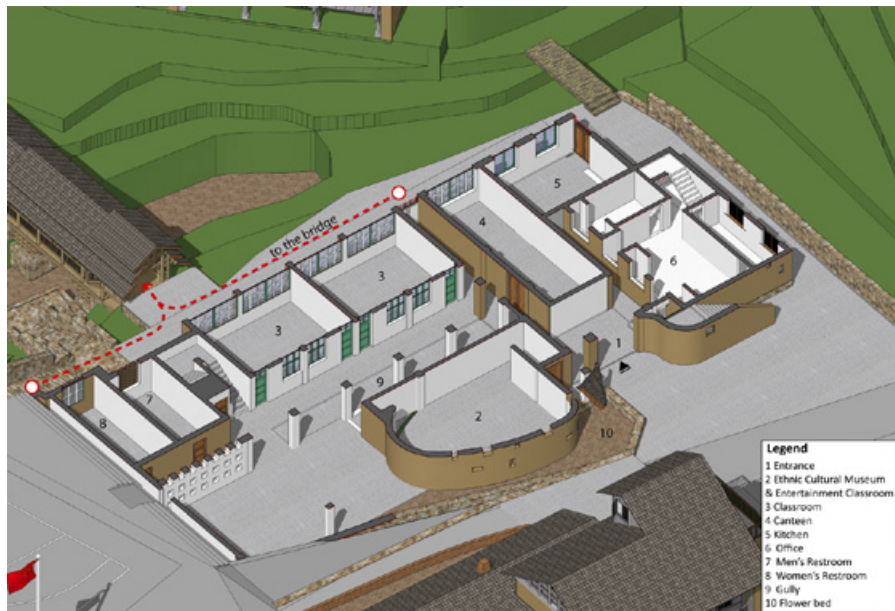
The ground floor created a connection from the interior space to the roads and to the new pedestrian bridge beyond the school building. (Source: Author)
